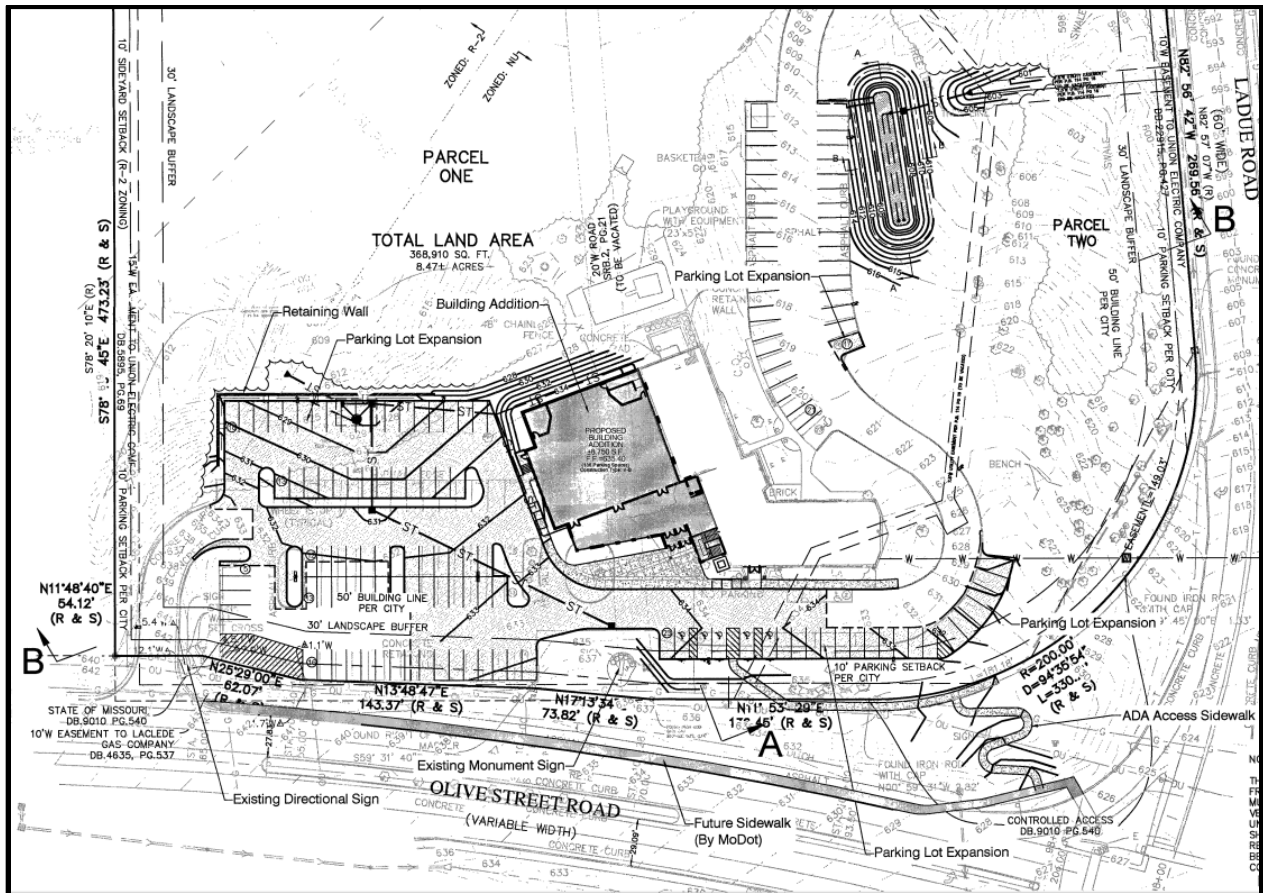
Portion of Site Development Section Plan (Plan Sheet SDP2)
